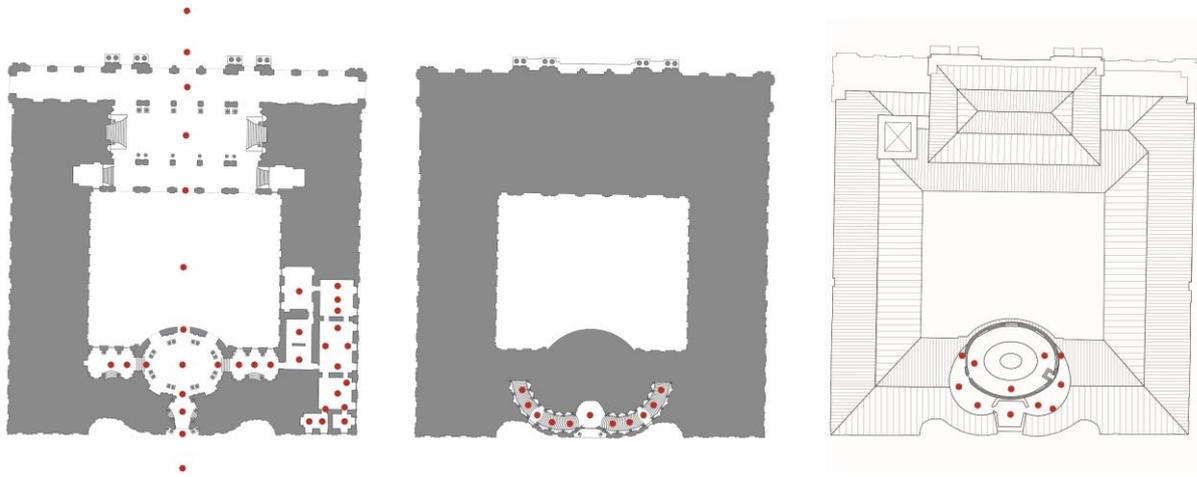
Plans (ground floor, first floor, top floor) with the distribution of VT viewpoints (Editing by M. Russo)
